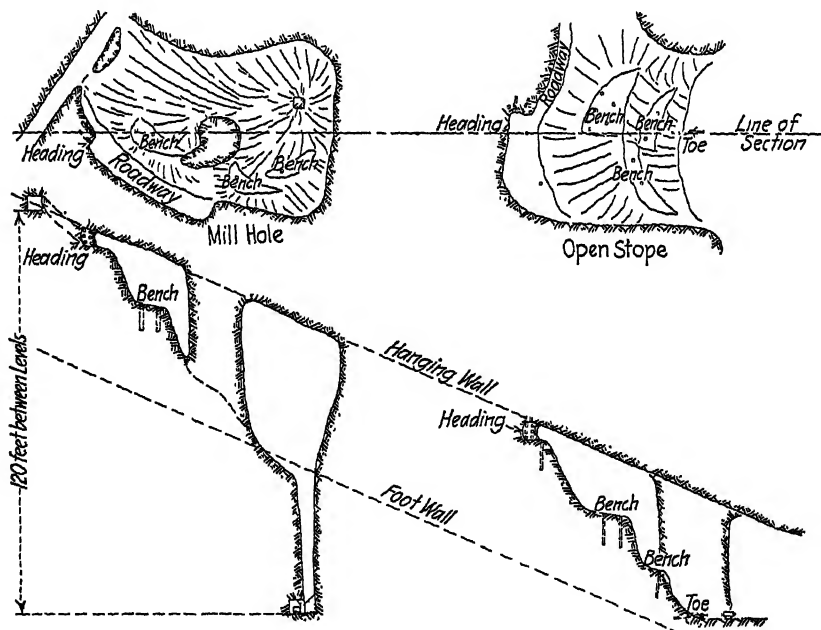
PLAN AND SECTION OF NO. 2 MINE, SHOWING METHODS OF PLACING HOLES.
